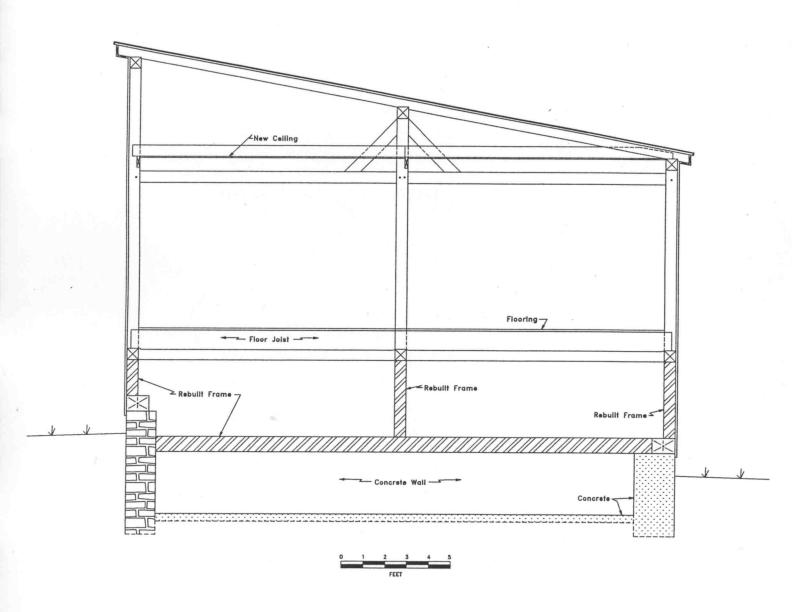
Sectional drawing of rear addition showing framing system, 1995.
